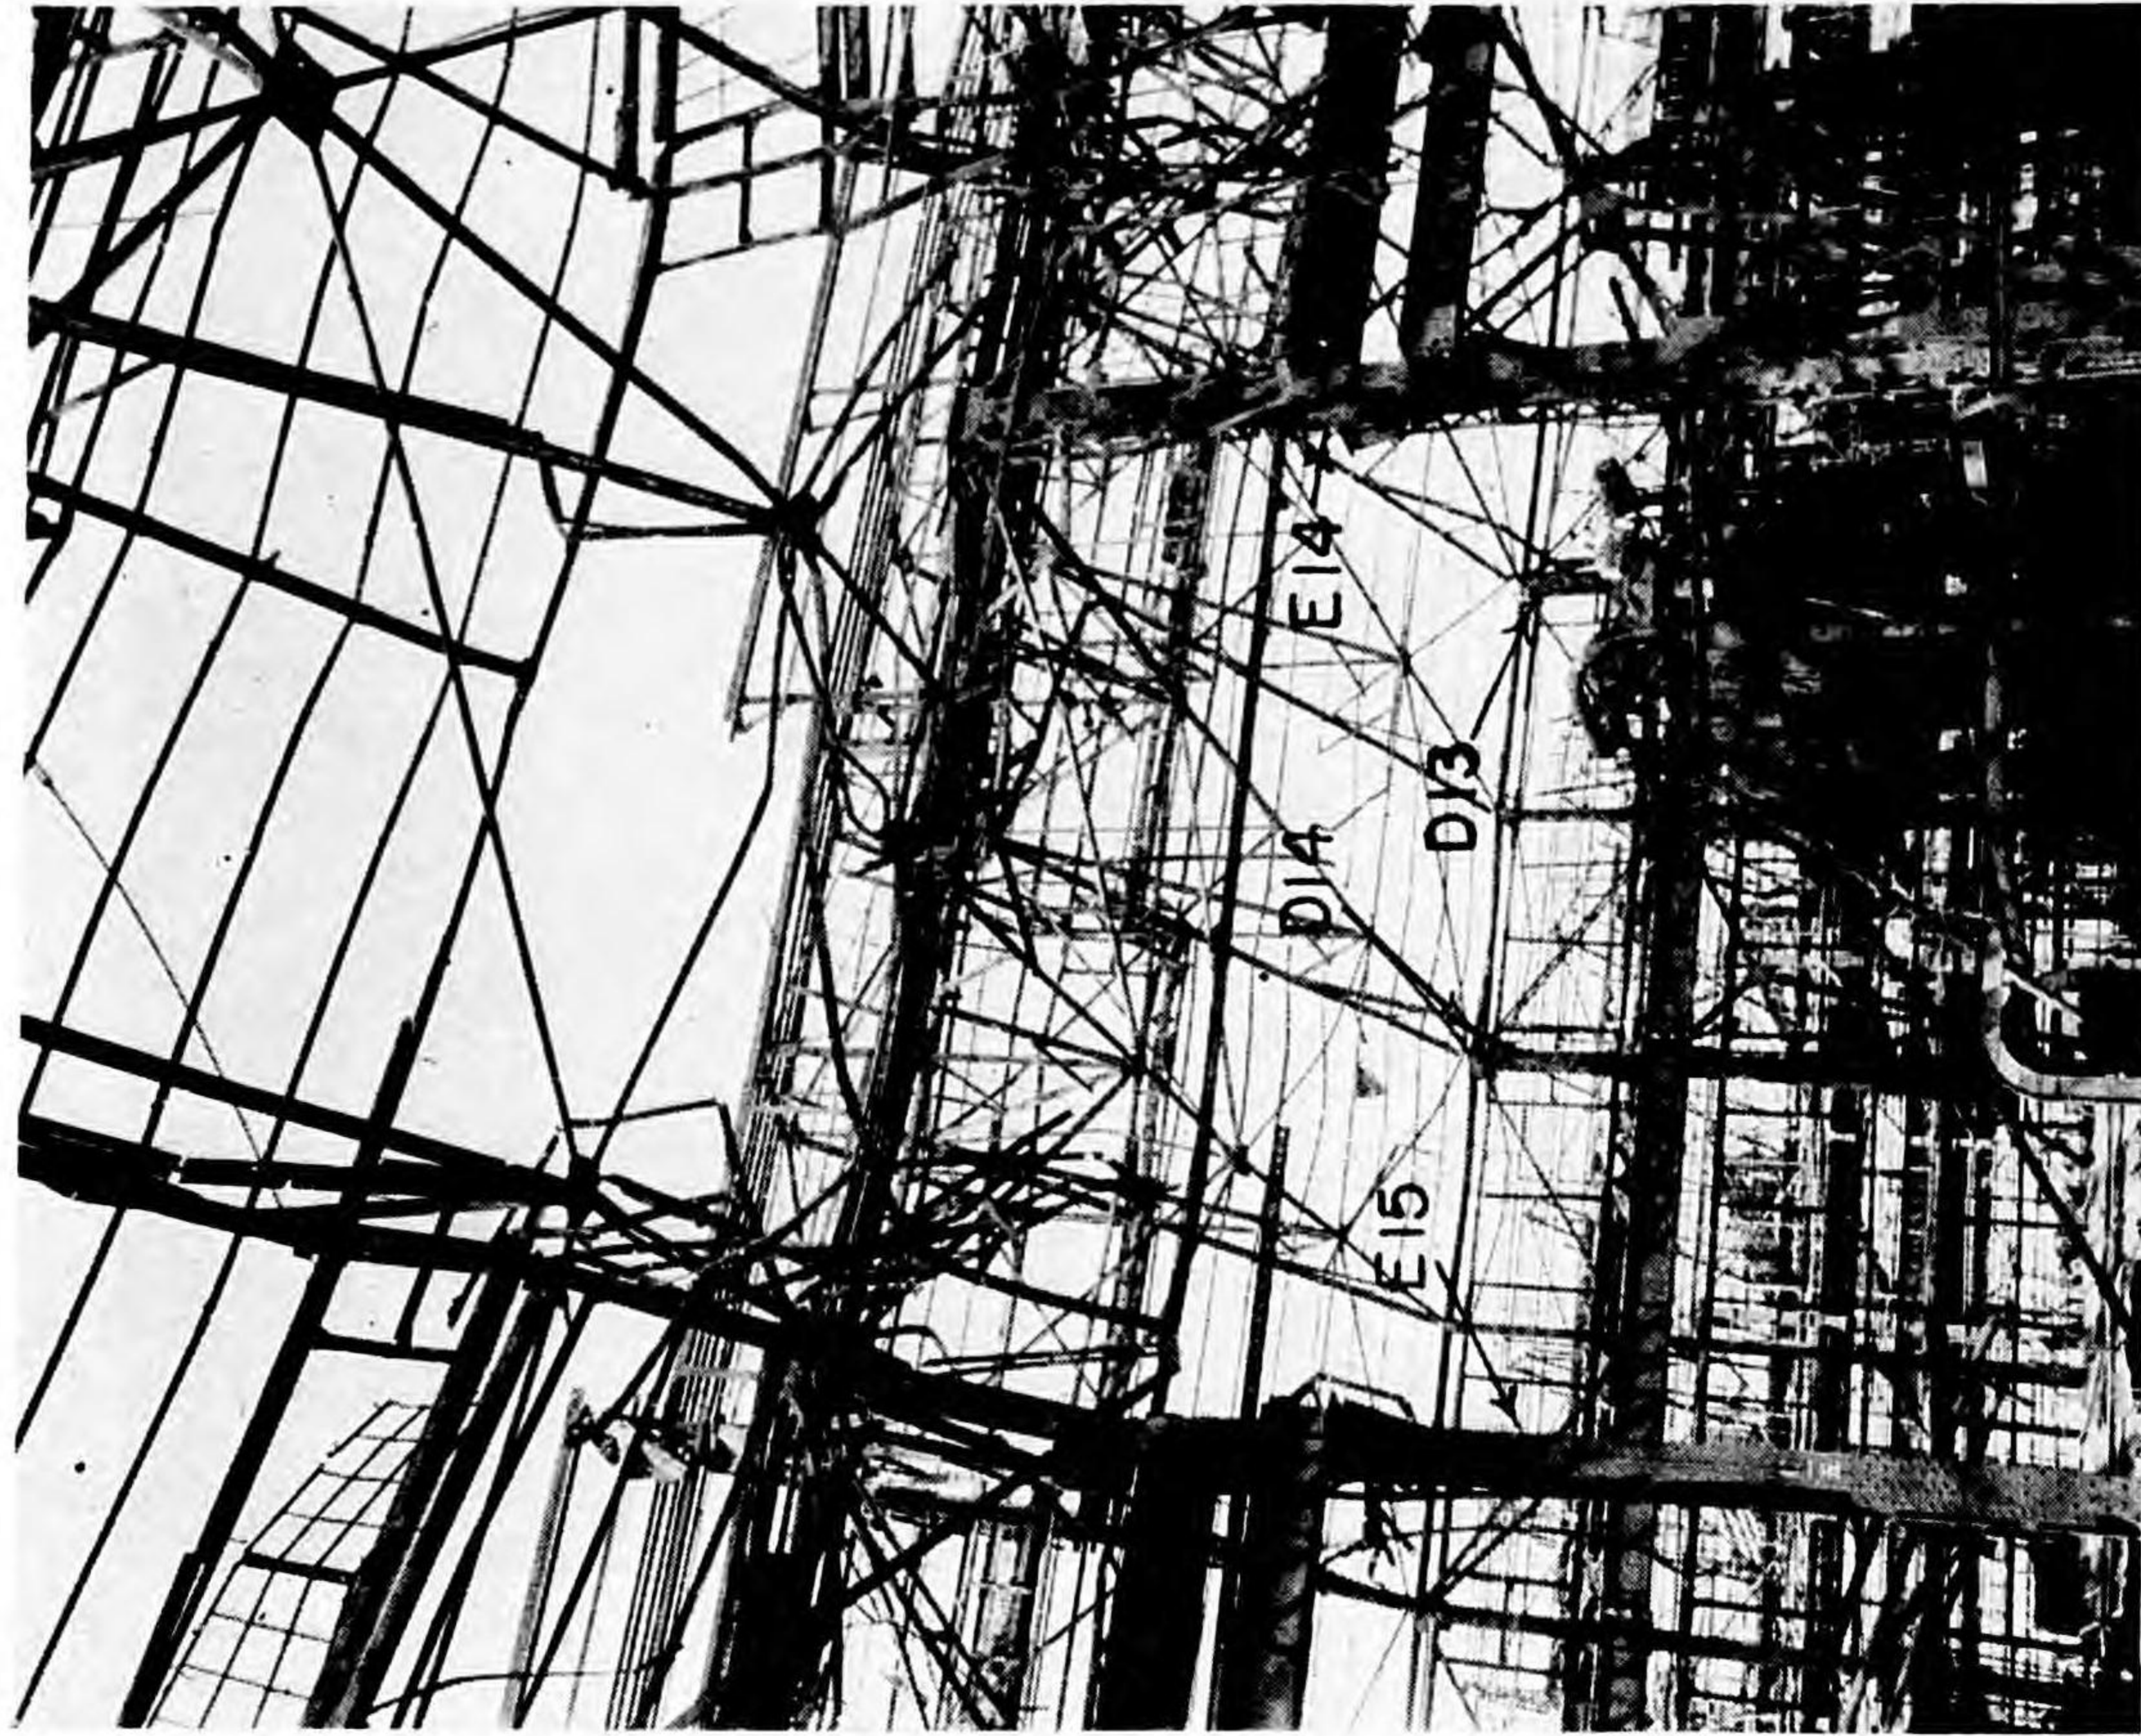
Building 301b; damage caused by Bomb 23 between Columns E15 and E14 looking NNW.
